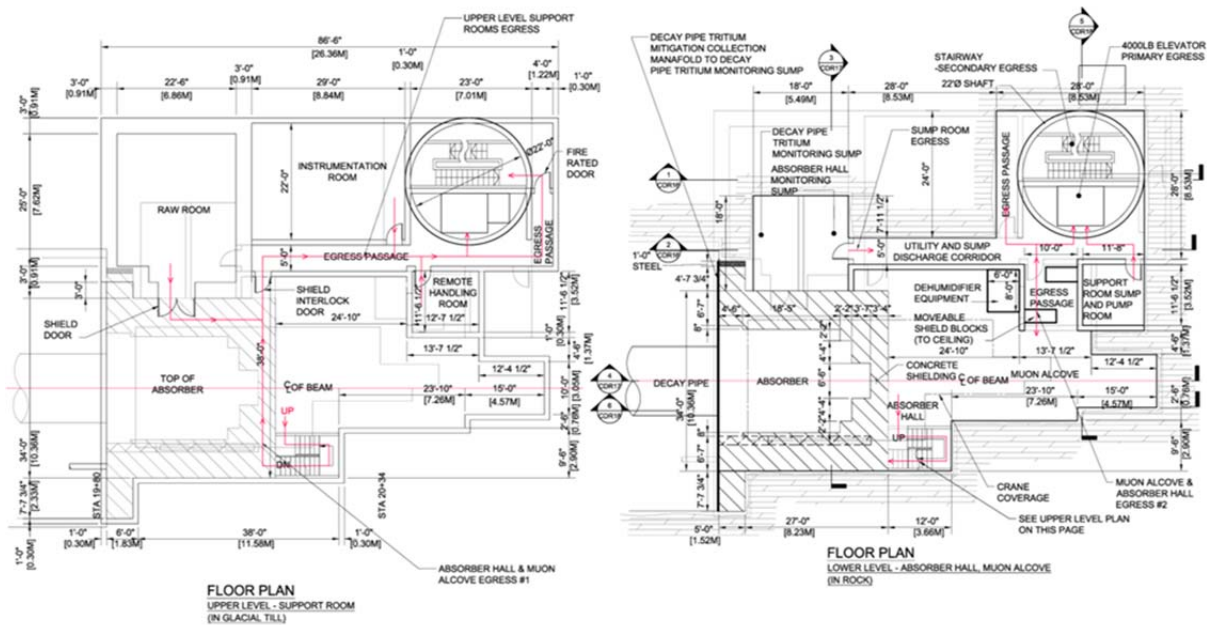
Absorber Hall, Muon Alcove, and support rooms egress routing.
